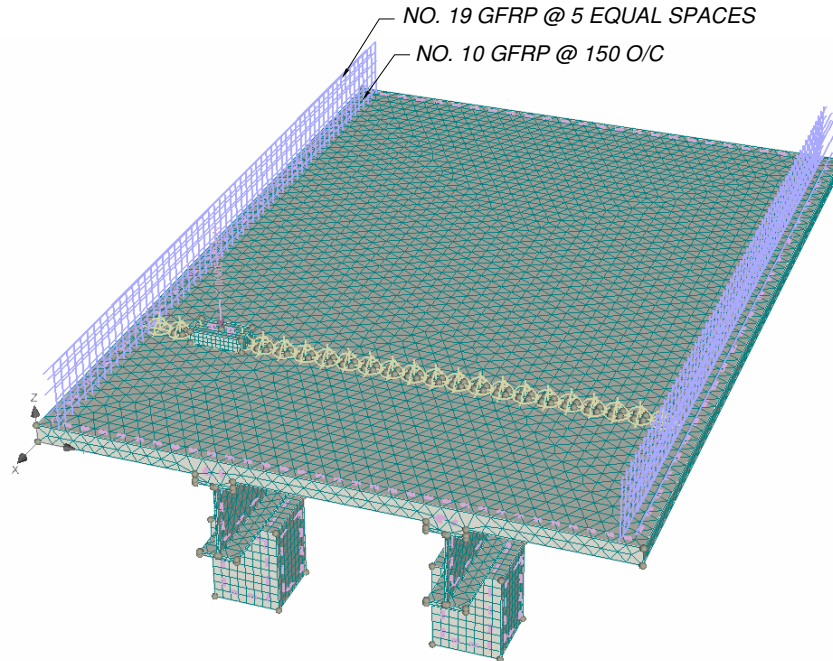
Isometric view of the discrete modeling of internal GFRP reinforcement located in traffic barrier walls
